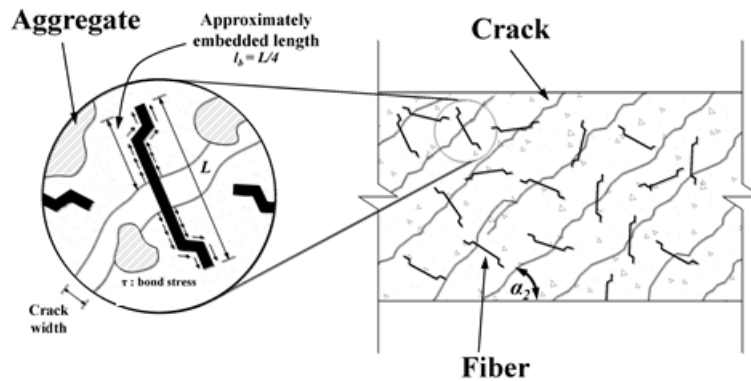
Steel Fibers tying cracks in Concrete
